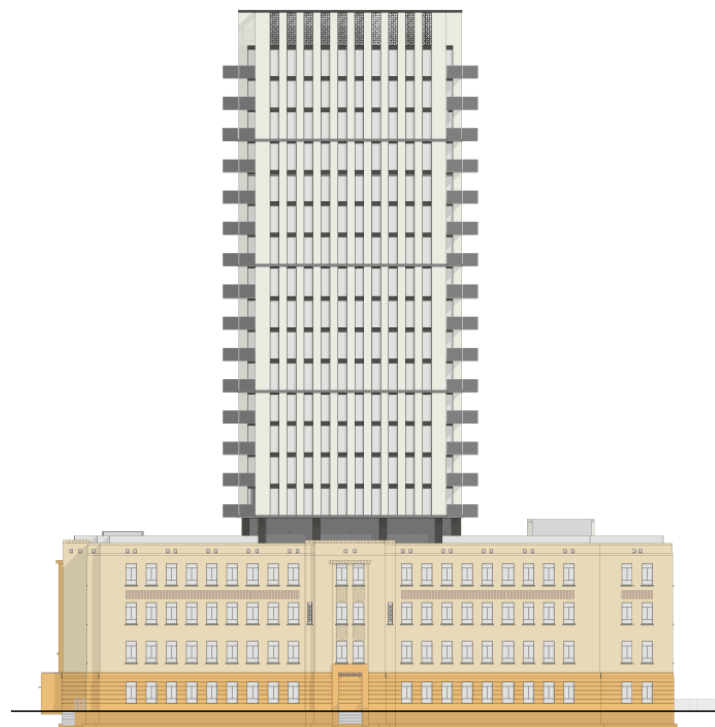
South elevation of the 16-storey tower showing alignment with south entrance. Source: omb Architects + Designers.
